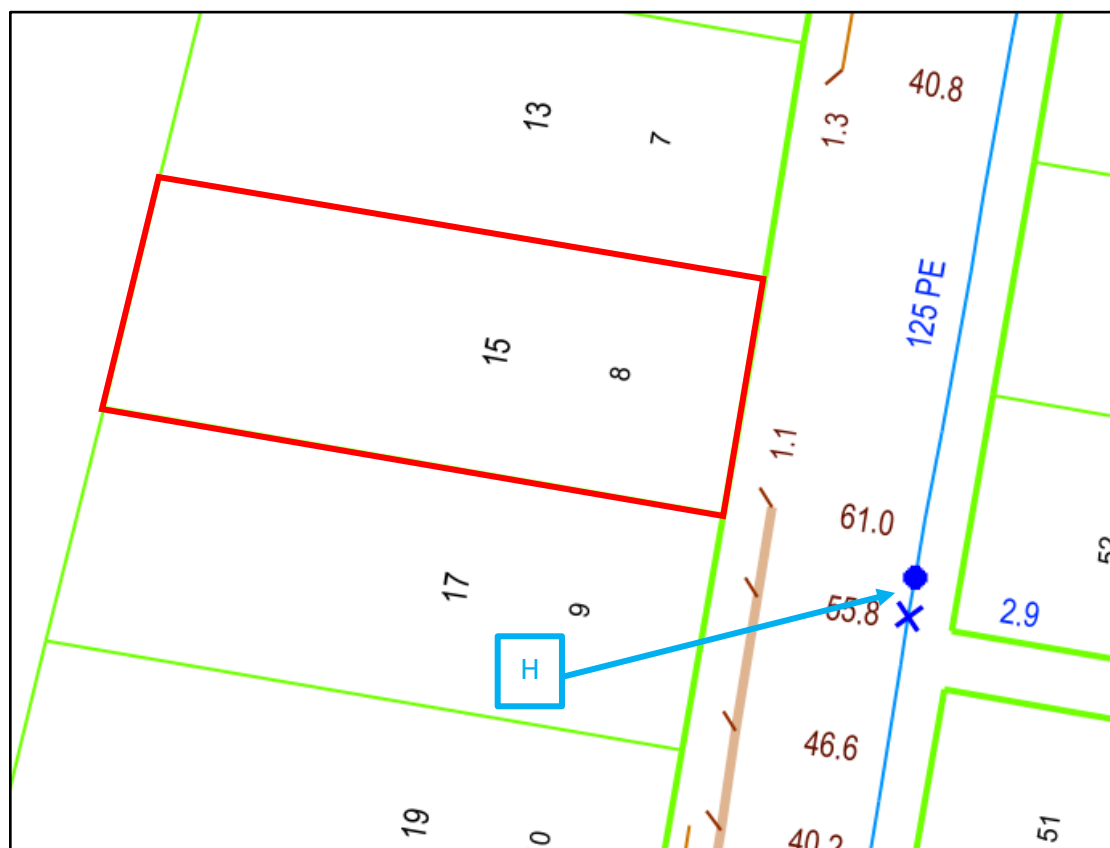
Section Sydney Water Reticulated Mains Water Supply Layout Plans
